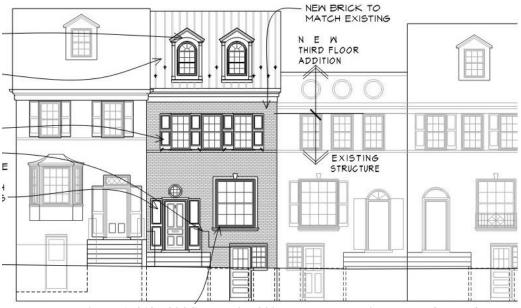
818 - 824 S. Lee with 820 proposed elevation second from left
